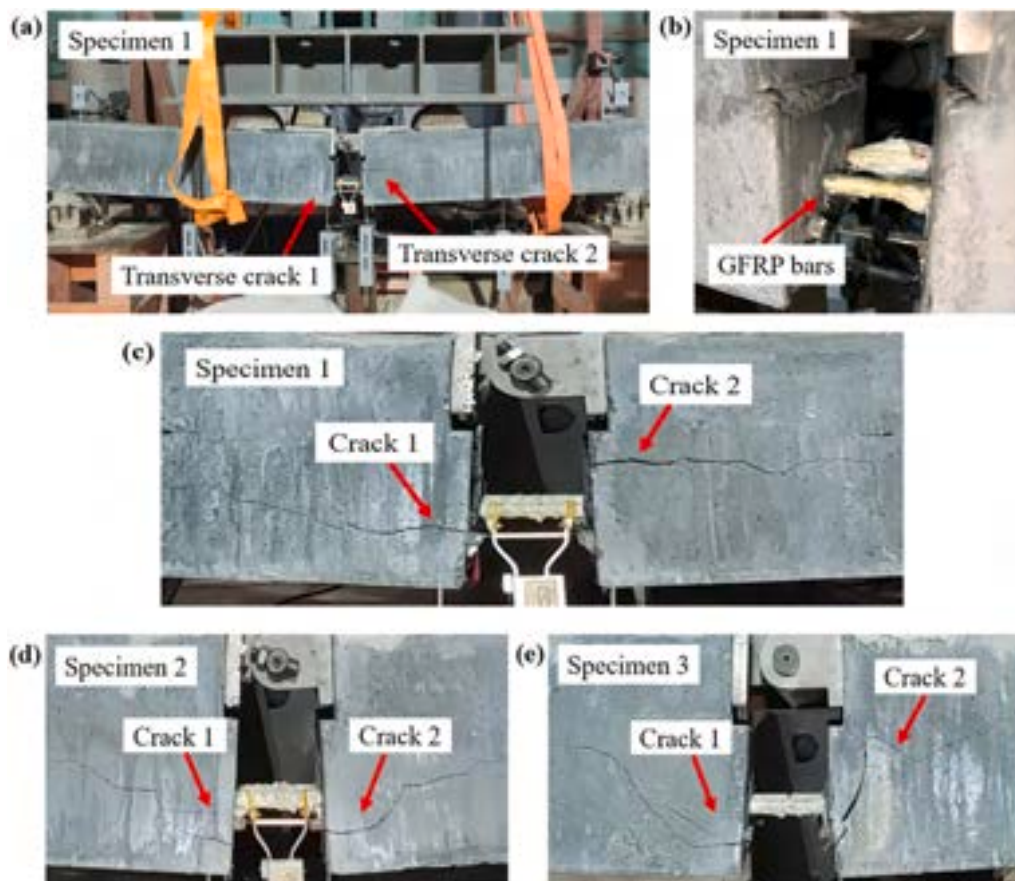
Final failure configuration and details. (a) Final failure of Specimen 1; (b) Failure of the GFRP bars in Specimen 1; (c-e) Details of Specimen 1–3.
